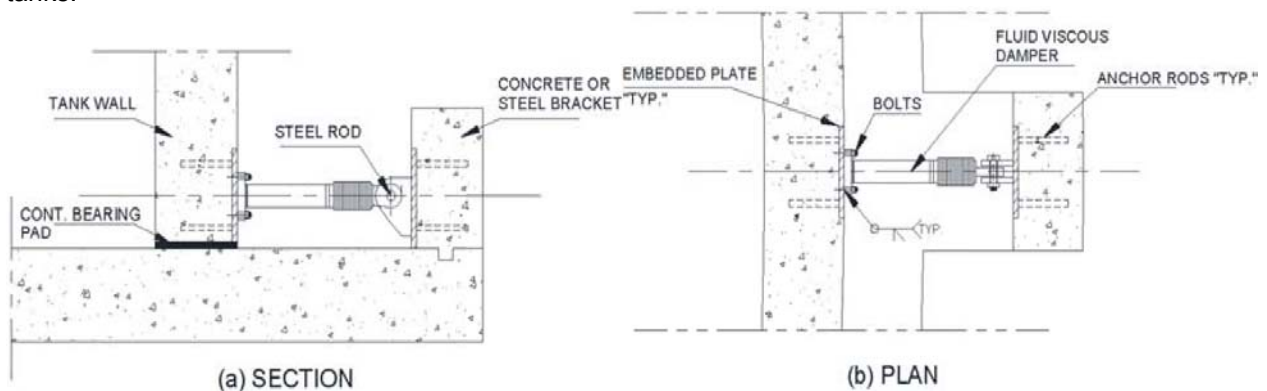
Fluid viscous damper connection detail; (a) Section, (b) Plan
